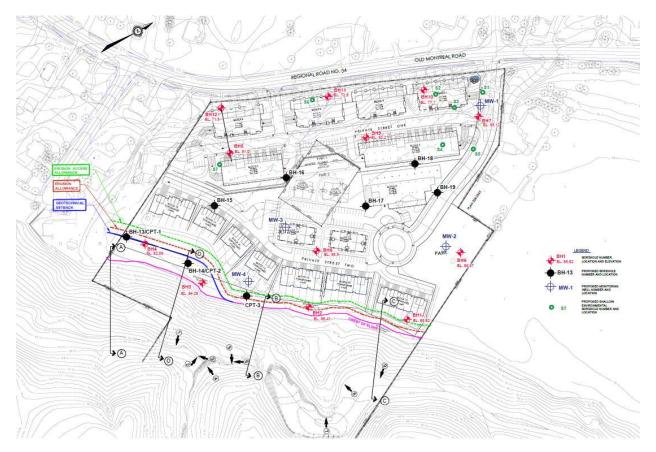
Supplementary Geotechnical Investigation Location Plan (drawing by EXP)
